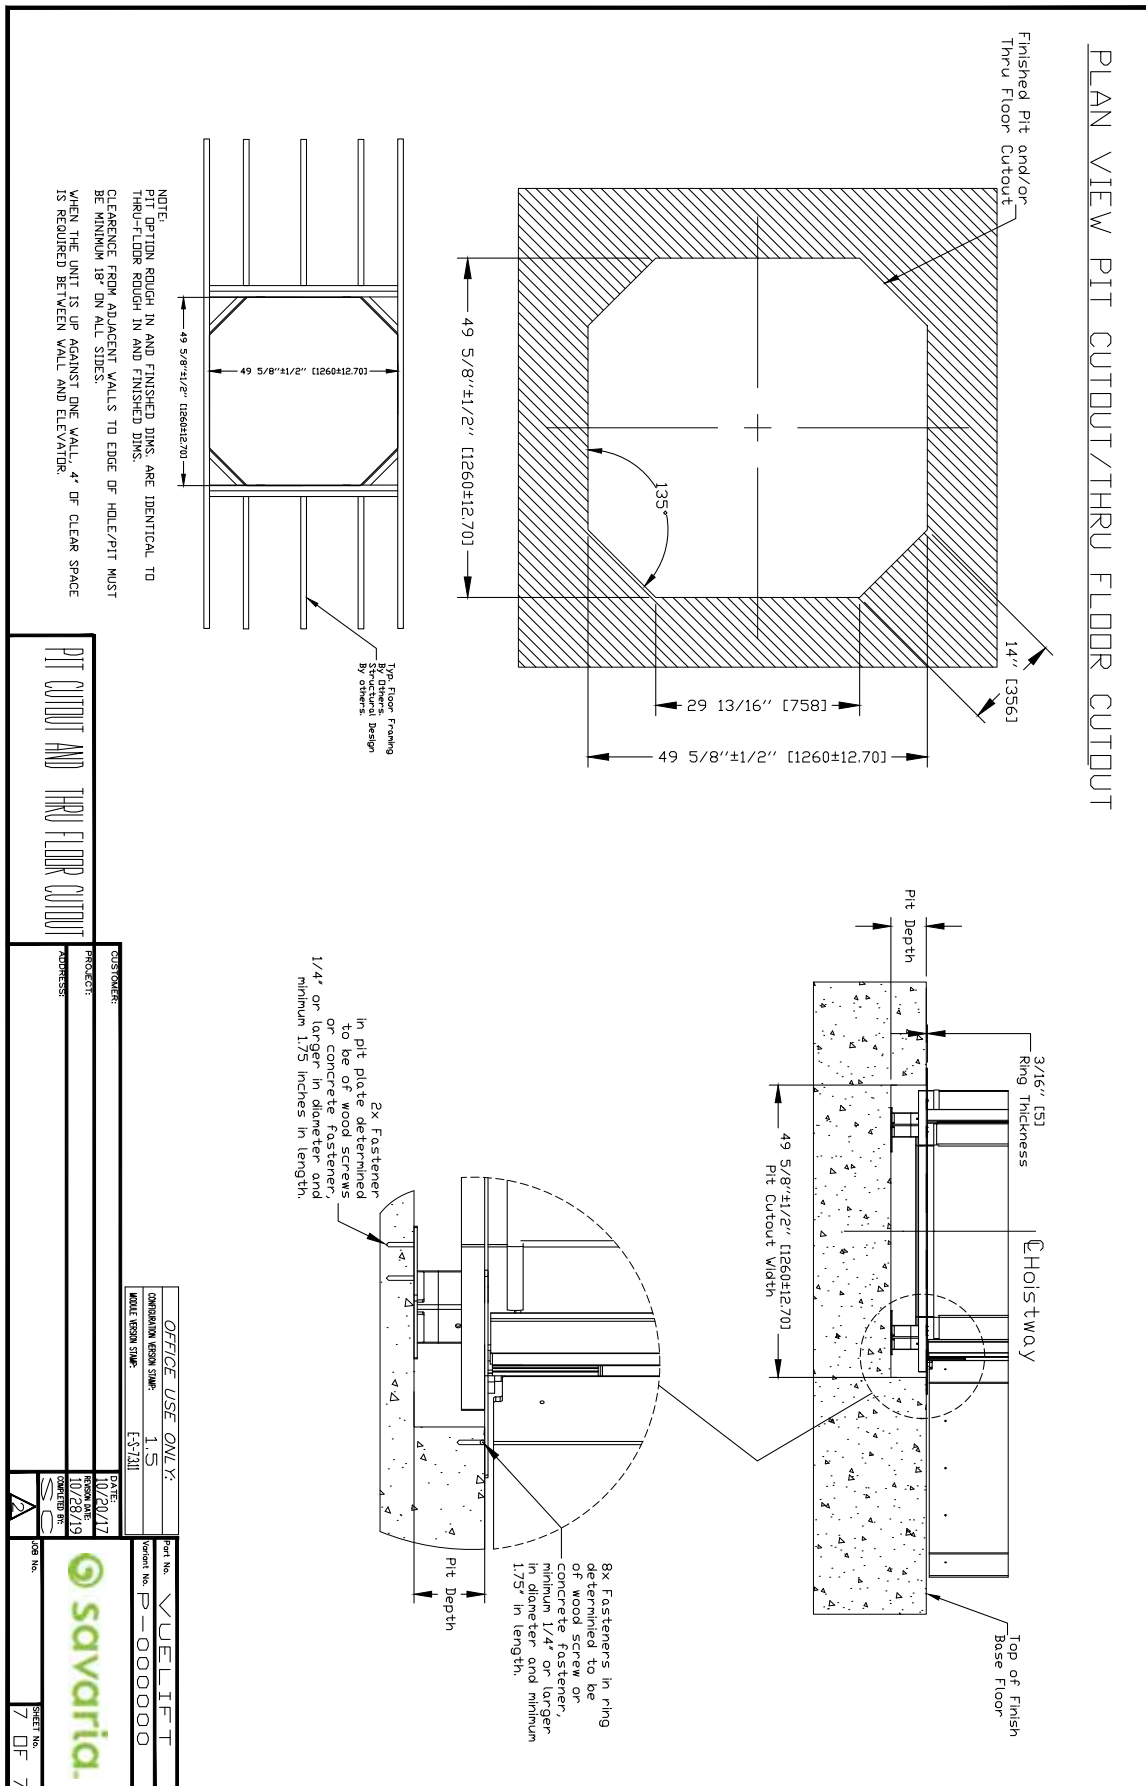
Pit cutout/thru-floor cutout (OAM, type 1)
